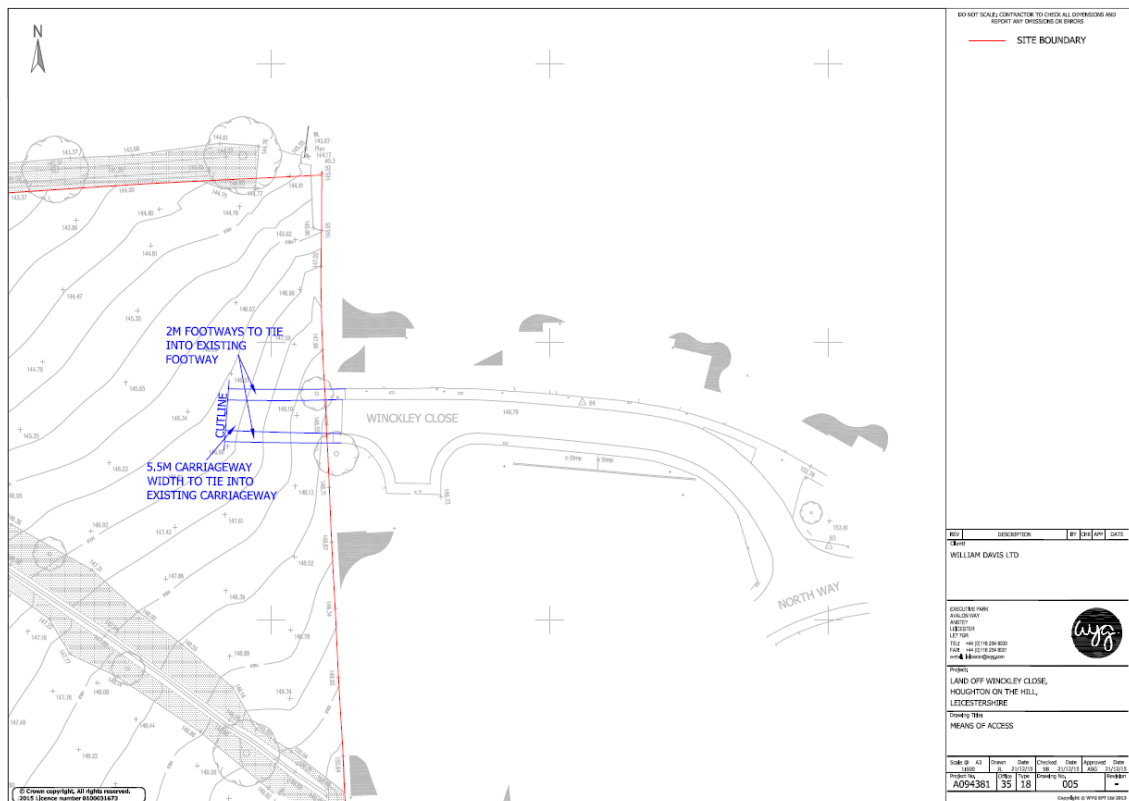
Proposed Site Access – Approved Drawing No. 005 (Means of Access)
